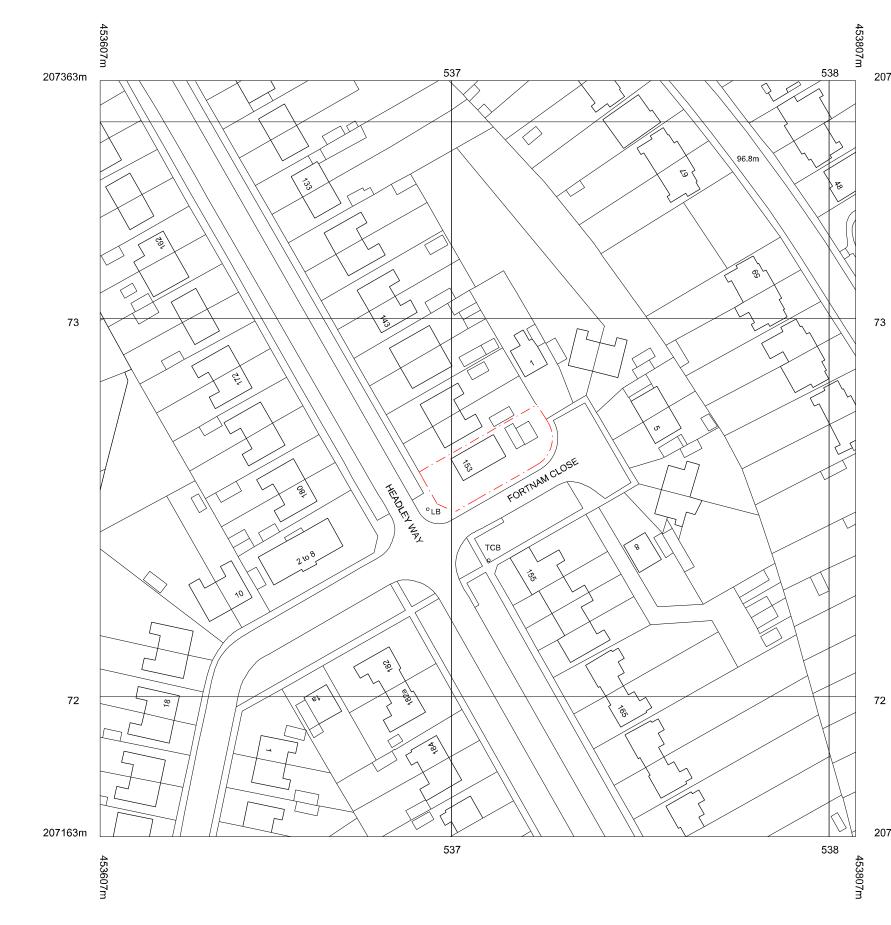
3D Site area plan showing site in immediate surrounding context.
